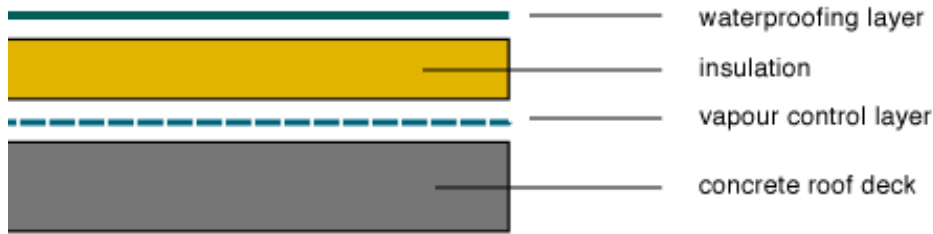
Roof section showing the layers of the roof after insulation (U-value depends on the thickness of the insulation) (GreenSpec, 2017).
